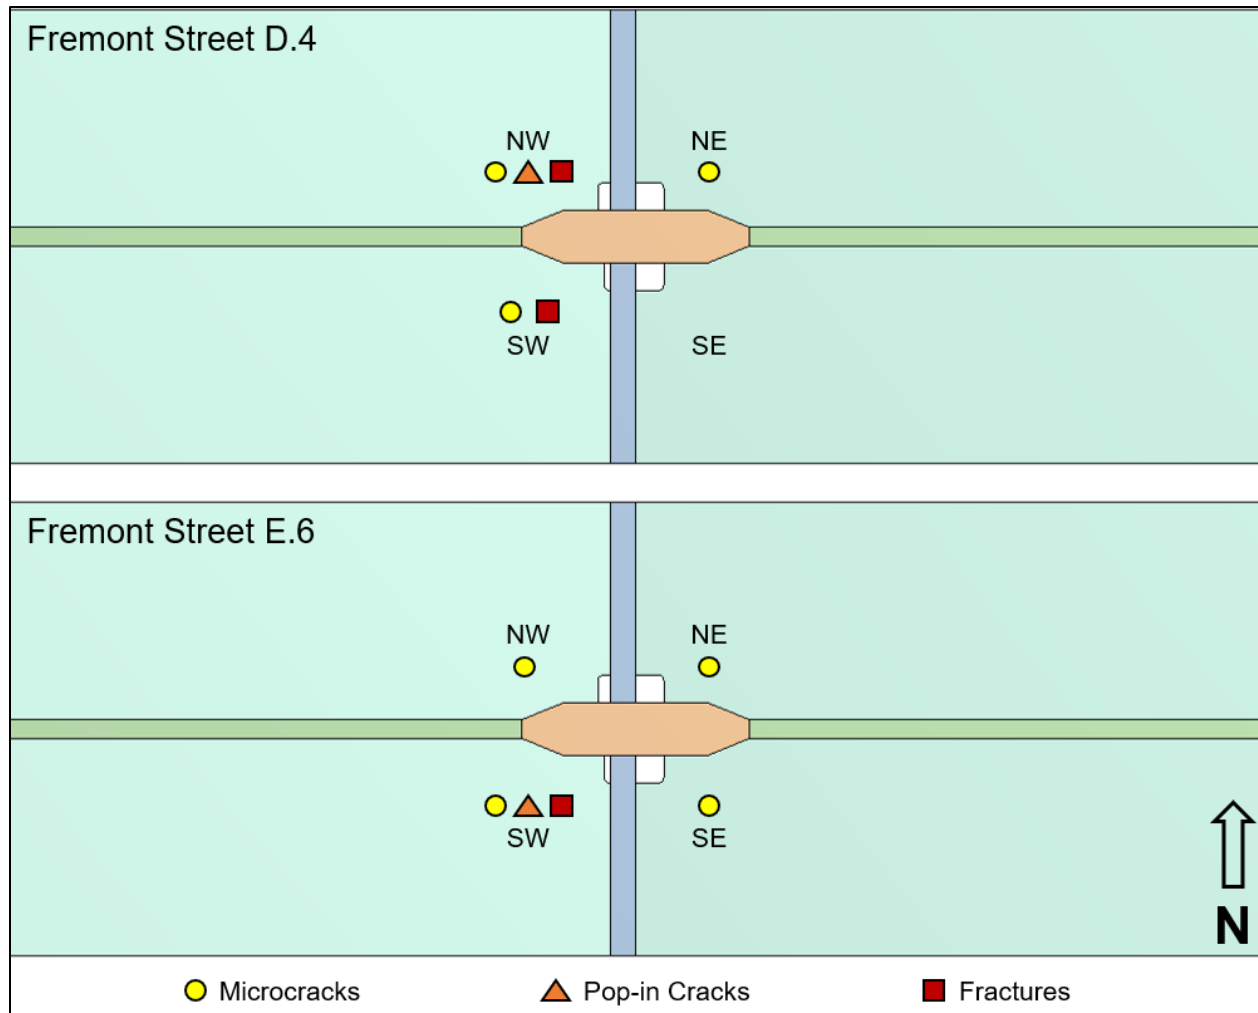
Summary of observed cracking and fractures. Diagram is generic and not representative of actual weld access hole dimensions. The thin, blue rectangles perpendicular to the orange hangers are the centerline stiffeners.
